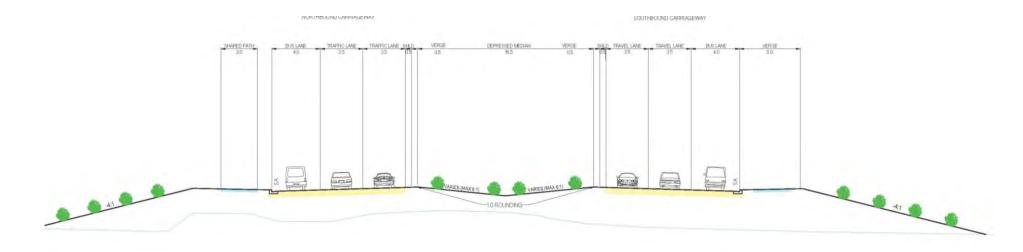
Indicative cross section and elevation of the proposed fill, about 500 m north of Vicar Park Lane (about chainage 3500)
